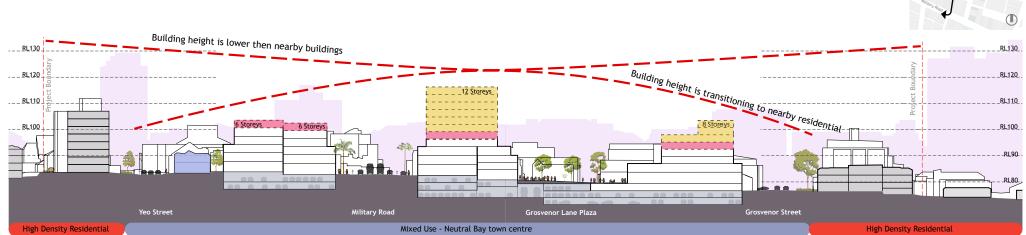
North-south section through Neutral Bay town centre looking west. New height limits will meet the demand for non-residential floorspace (pink) with a few taller residential towers (yellow) to help provide much needed public benefits. Details on Planning Proposal and VPAs can be found in Chapter 3.4.
